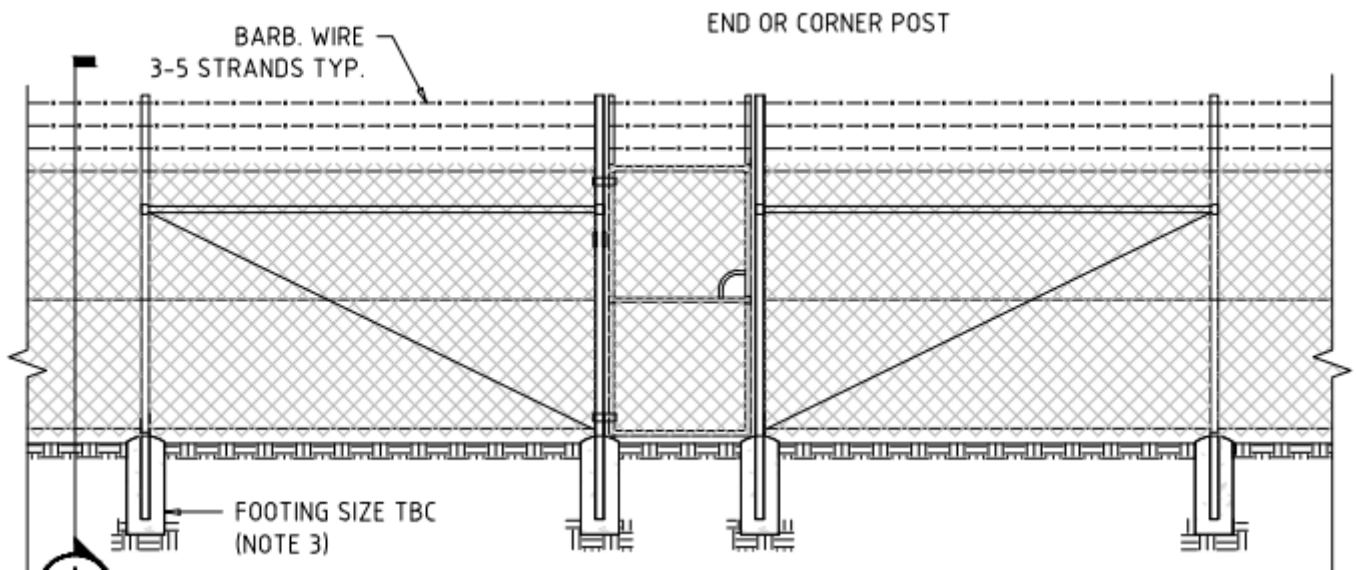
Elevation of proposed security fencing (Advertised Development Plans)
